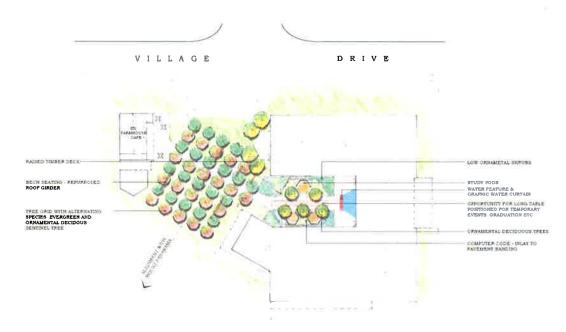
Landscape Plan Source: Thomson Adsett Architects
